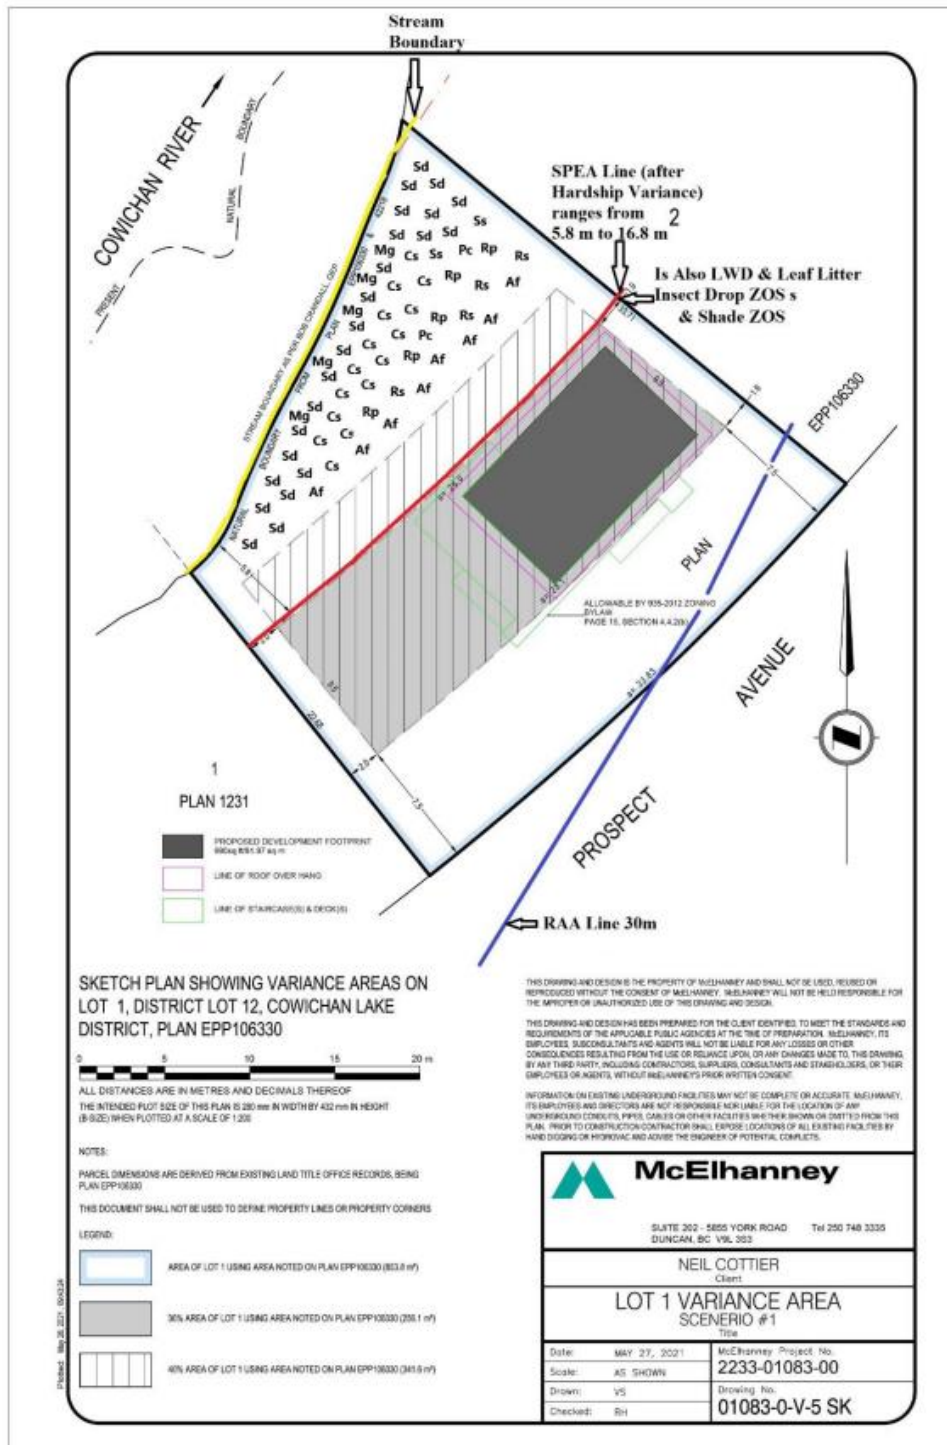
Plan of proposed variance and riparian restoration planting plan for 8 Prospect Avenue
